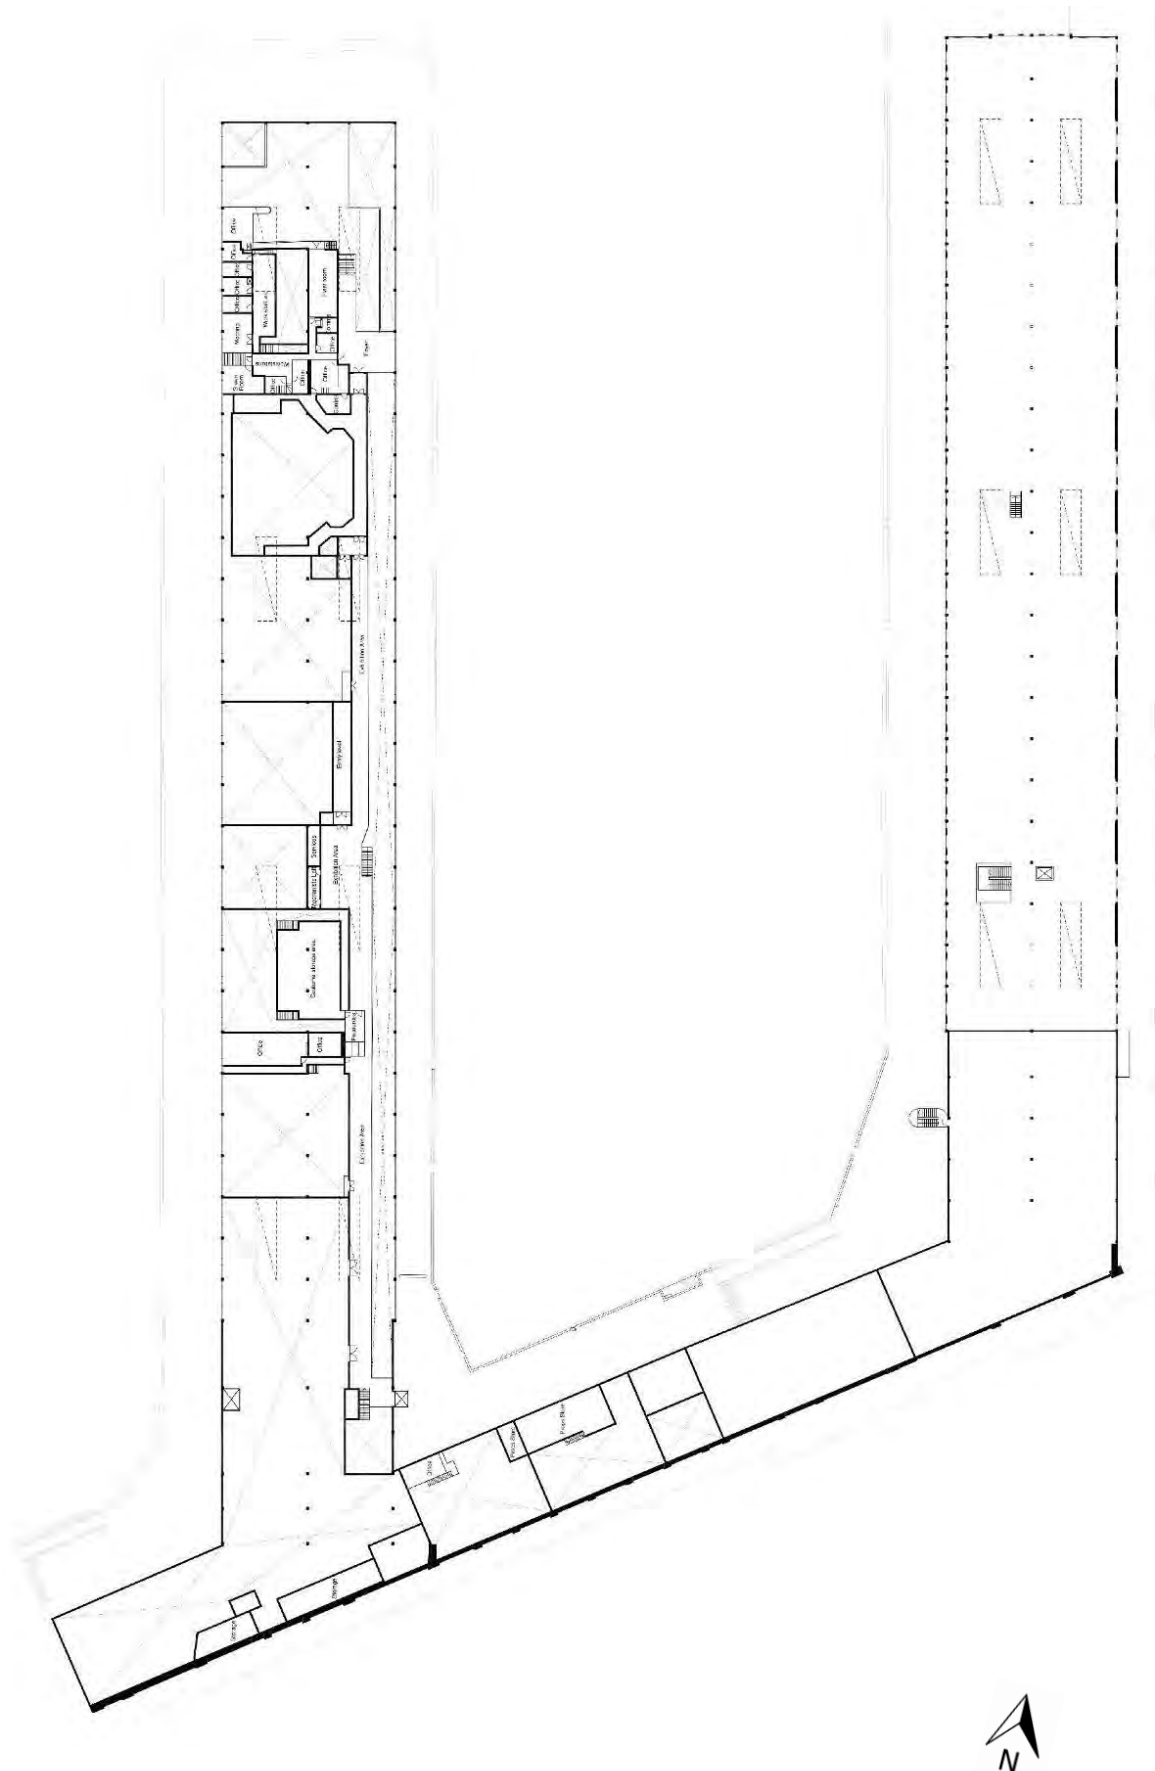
Existing Second Floor Plan. Resource from TZG Architects.
